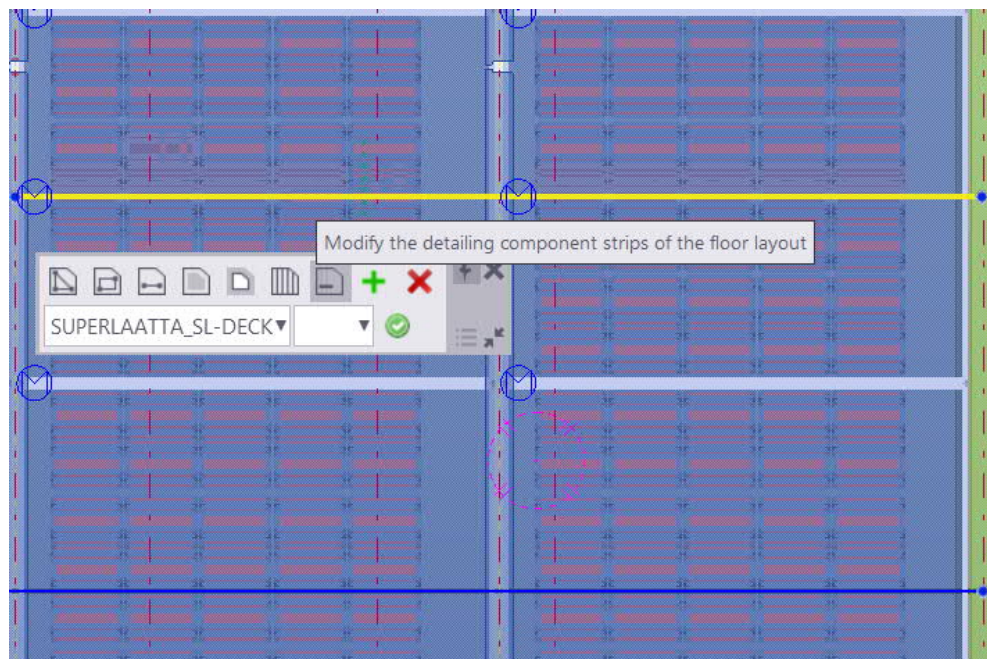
Detailing component strips of the floor layout (Tekla Structures snapshot)
